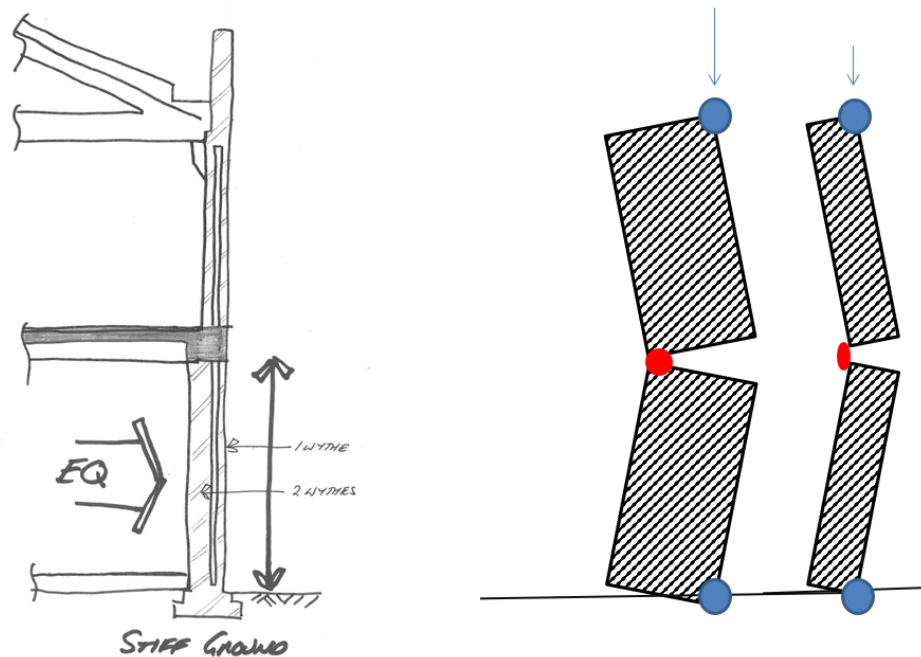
B.30: Boundary conditions for lower cavity wall with upper wall and parapet above
